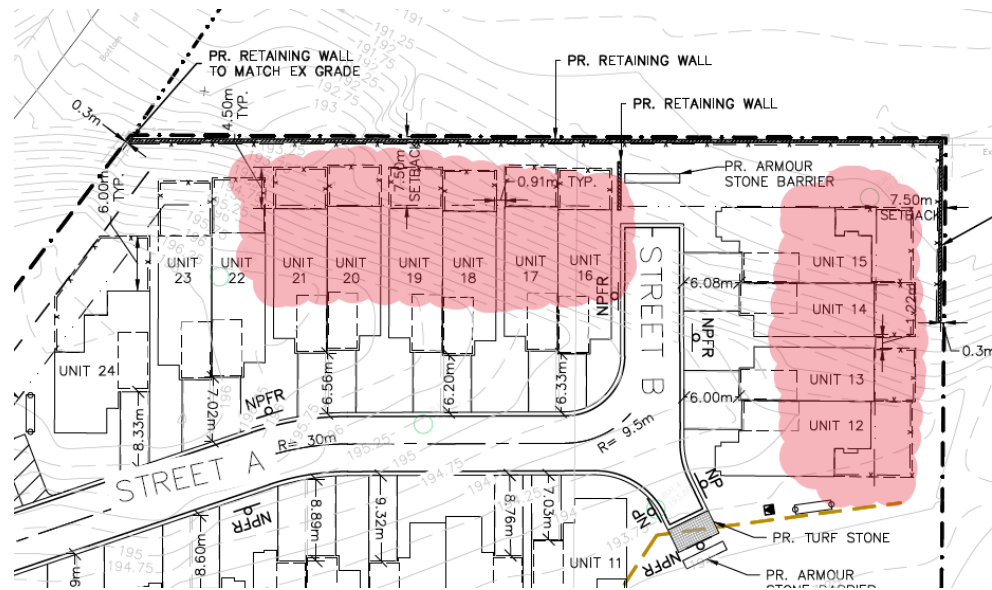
Deck Yard Encroachment Locations – Units 12 through 21
